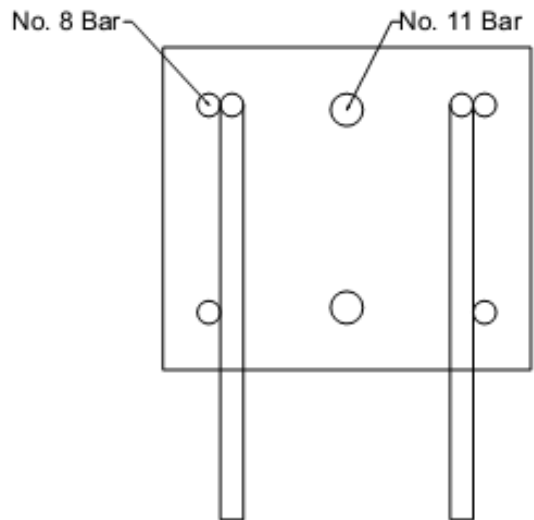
Longitudinal column reinforcement-4 No. 8 bars + 2 No. 11 bars. Transverse reinforcement not shown.
